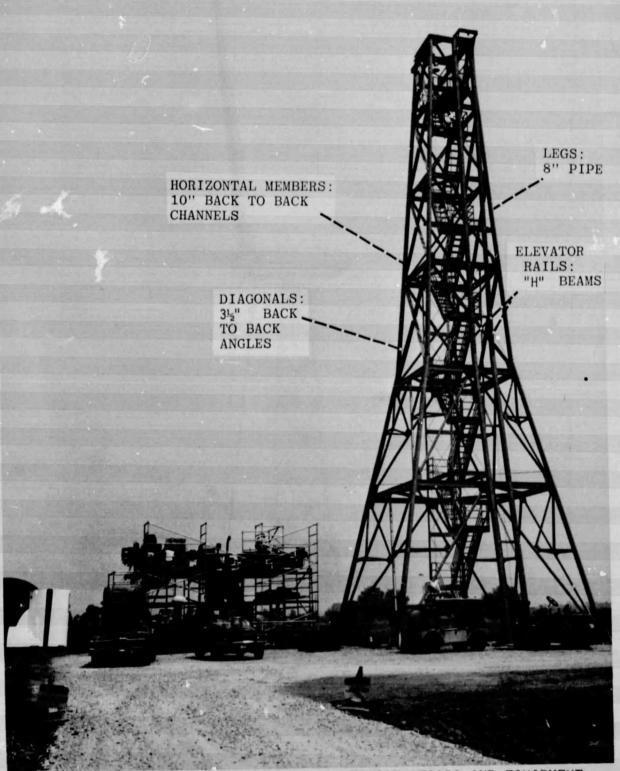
ORIGINAL MOD-O TOWER WITH SERVICE STAIRS AND EQUIPMENT RAILS
